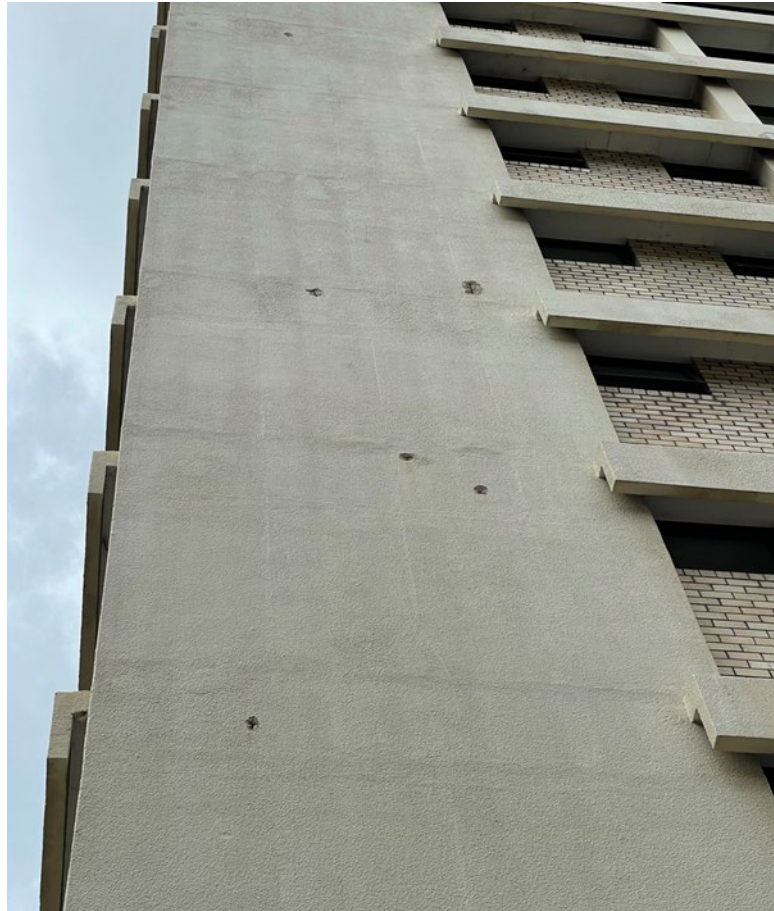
Spalling of concrete on wall elevation due to corrosion and 'concrete cancer'. Likely to be caused by reinforcement with insufficient cover and building exceeding its design life. Poses a very significant safety risk due to concrete pieces falling without notice to ground.
